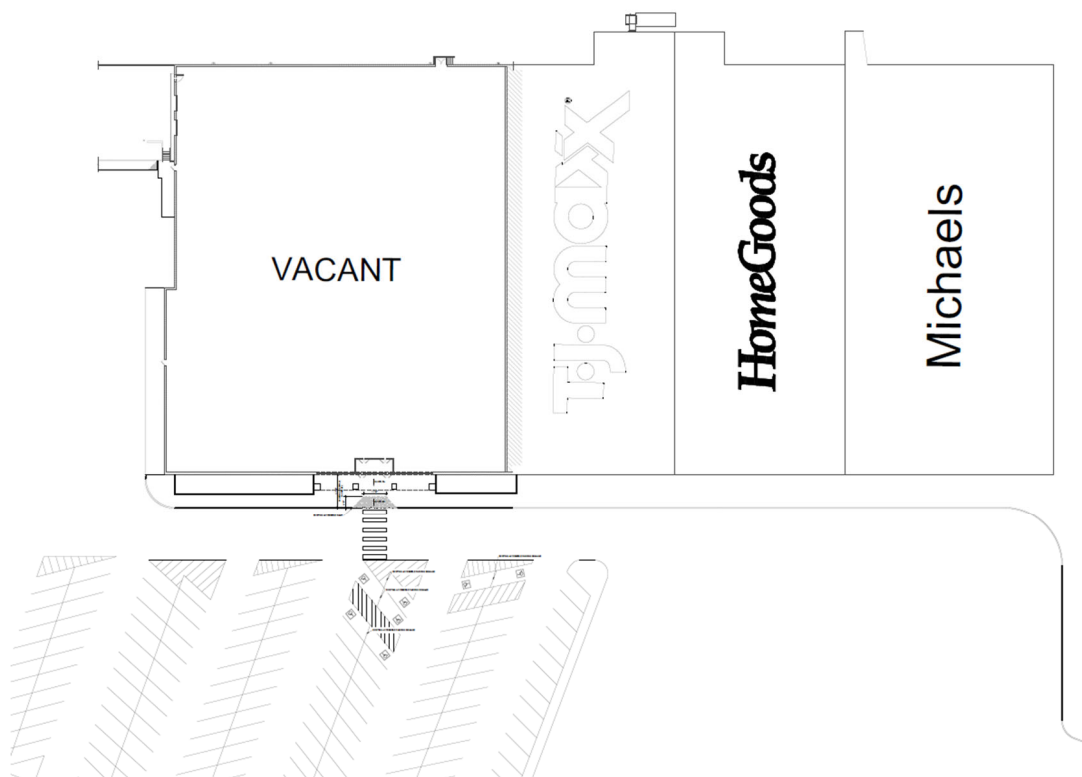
Excerpt of site plan showing existing Orchard Corners shopping center tenants.
